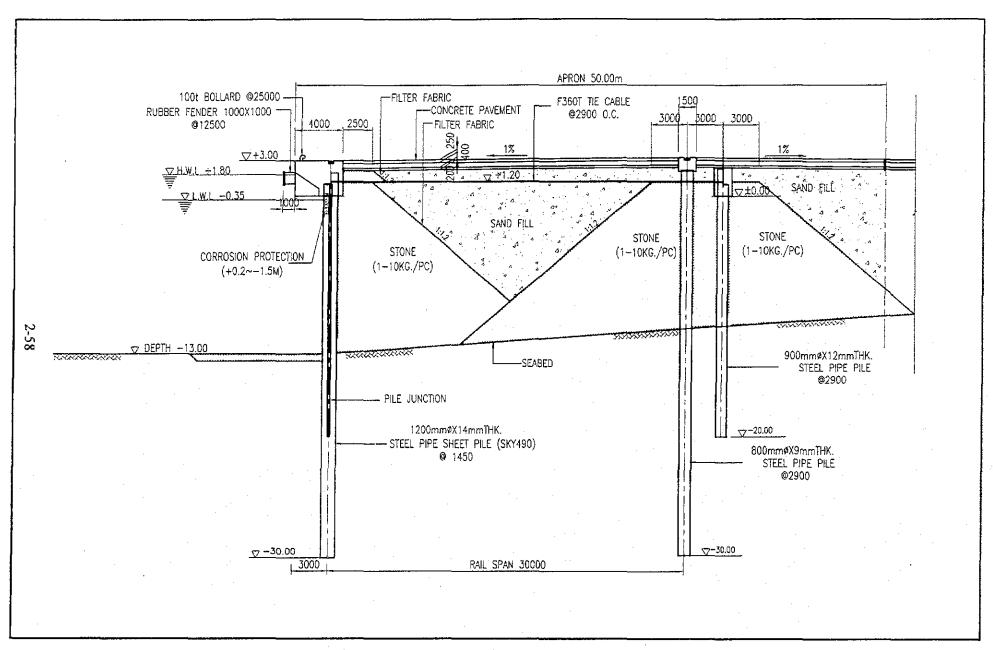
(1) Steel Pipe Sheet Pile Type Quaywall for Container Berth
